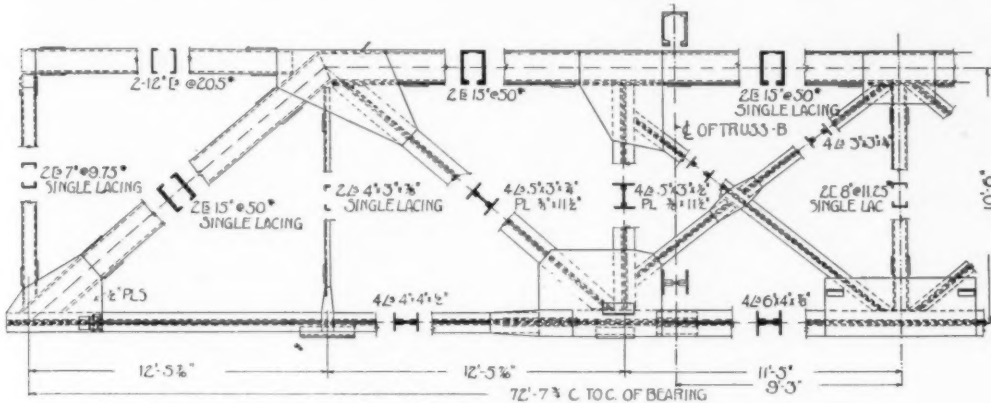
Detail of trusses A, showing the location and elevation of trusses B.
